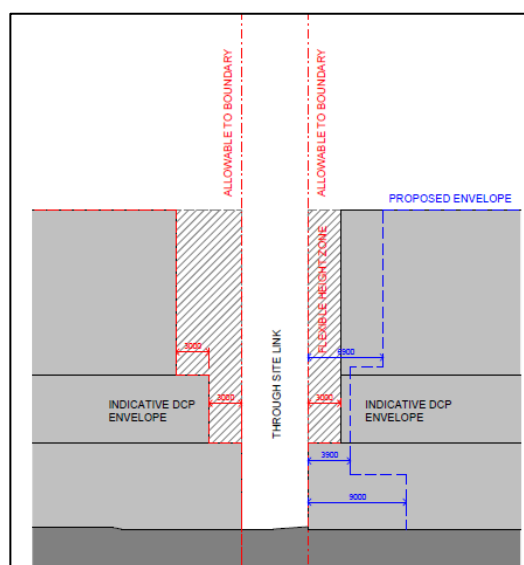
Section showing the DCP envelope and the proposed building envelope to Anzac Parade (Source: SJB Architects)
